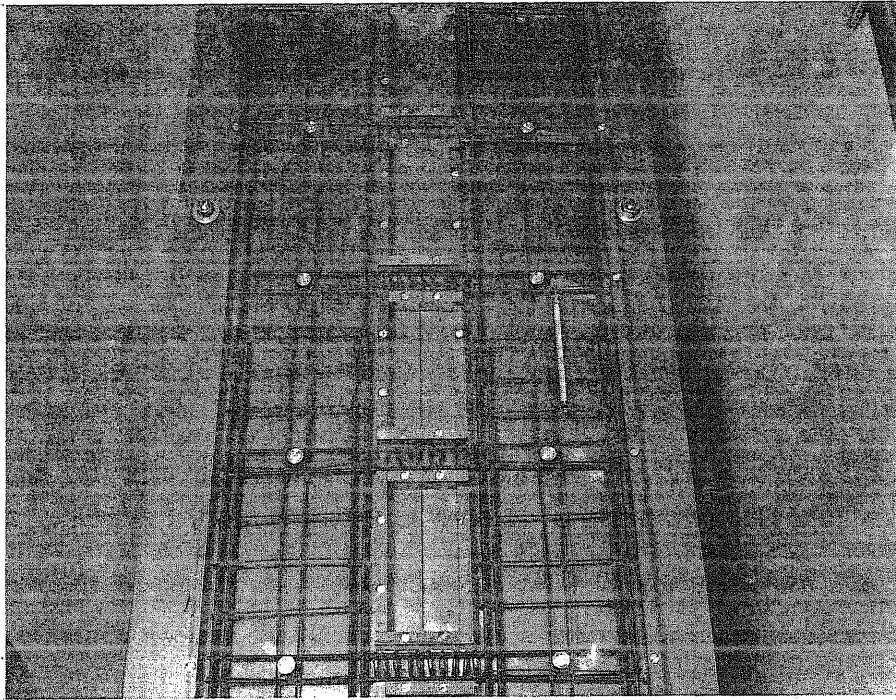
Detail of Cutoff in Wall Reinforcement (Frame D)
